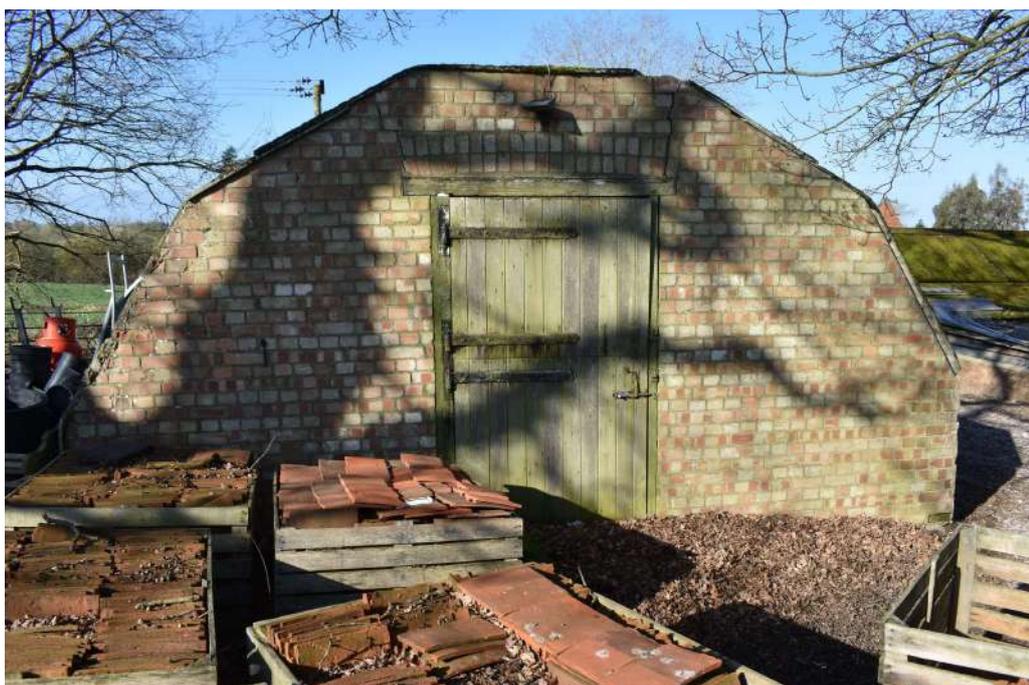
Detail of bricks above door of western wall of the handcraft hut. Photograph taken facing west.
